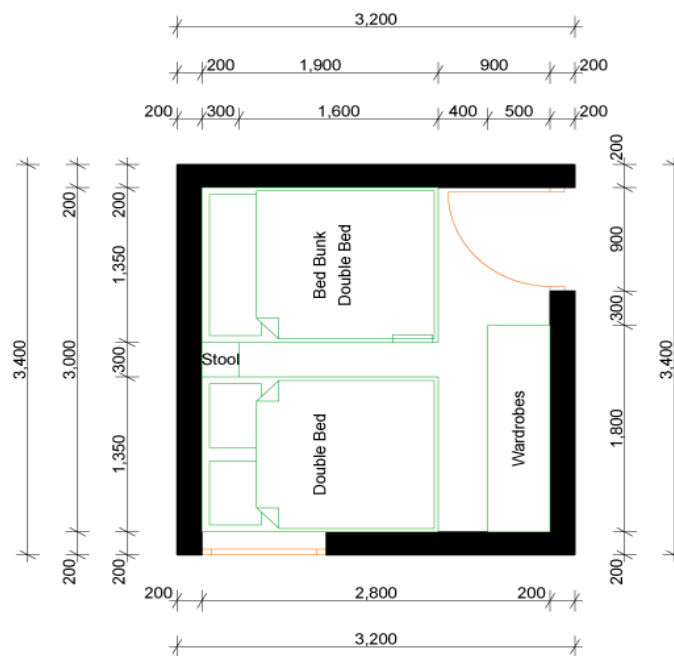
Two Bedroom, Bedroom, Furniture Layout Two
